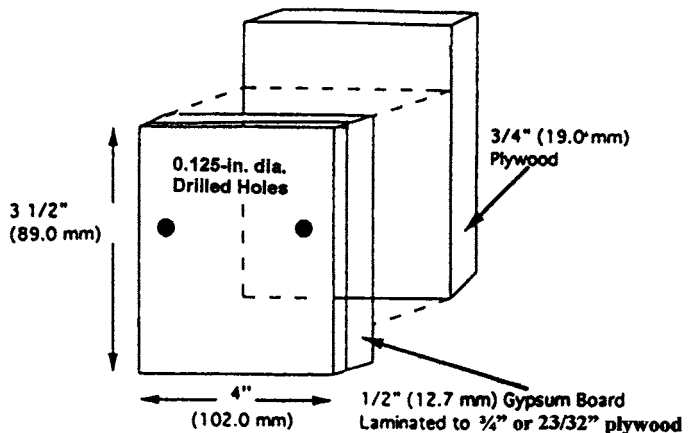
Predrilled Shear Test Specimen Prior to Assembly
